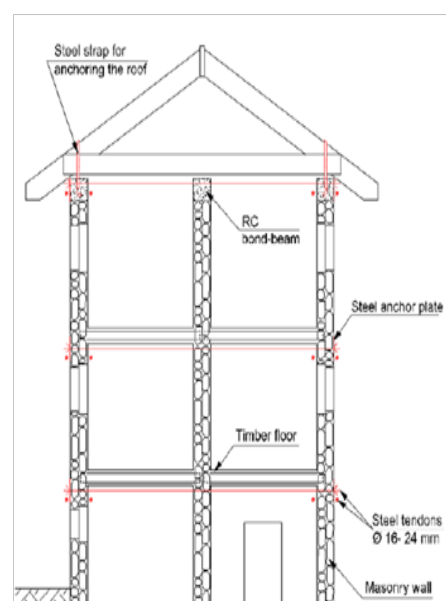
Height distribution of horizontal ties for reinforcing stone masonry
